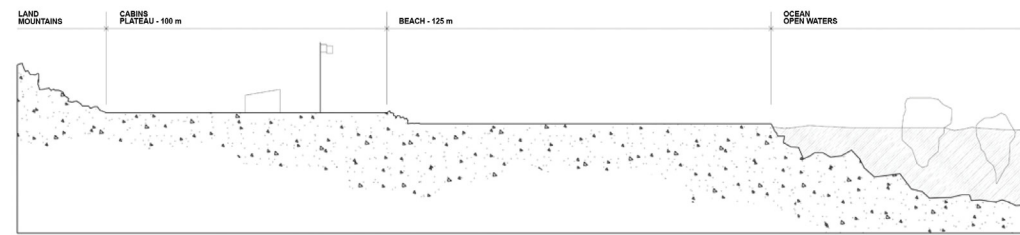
A section through the site at Cape Christian (Giraldeau, Havelka).
